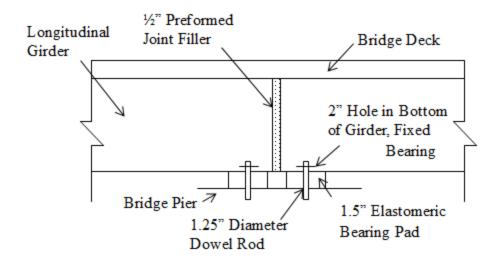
Dowel rod through pier cap, bearing pad, and girder (not to scale)
